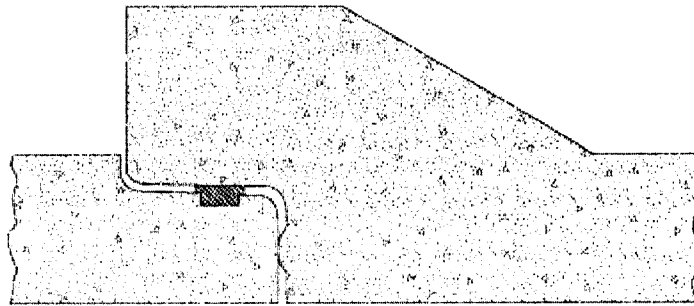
Typical cross section of spigot groove type joint with O-ring gasket
